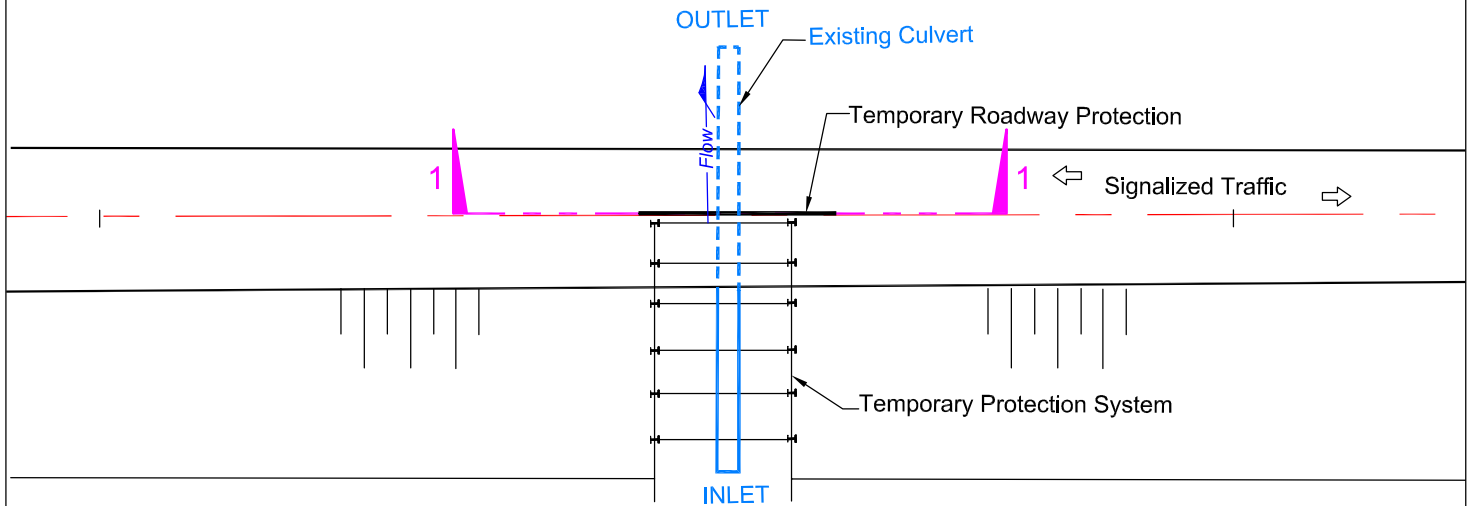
B: HALF AND HALF CONSTRUCTION WITH BRACED CUT SIDES OR ANCHOR SYSTEM
